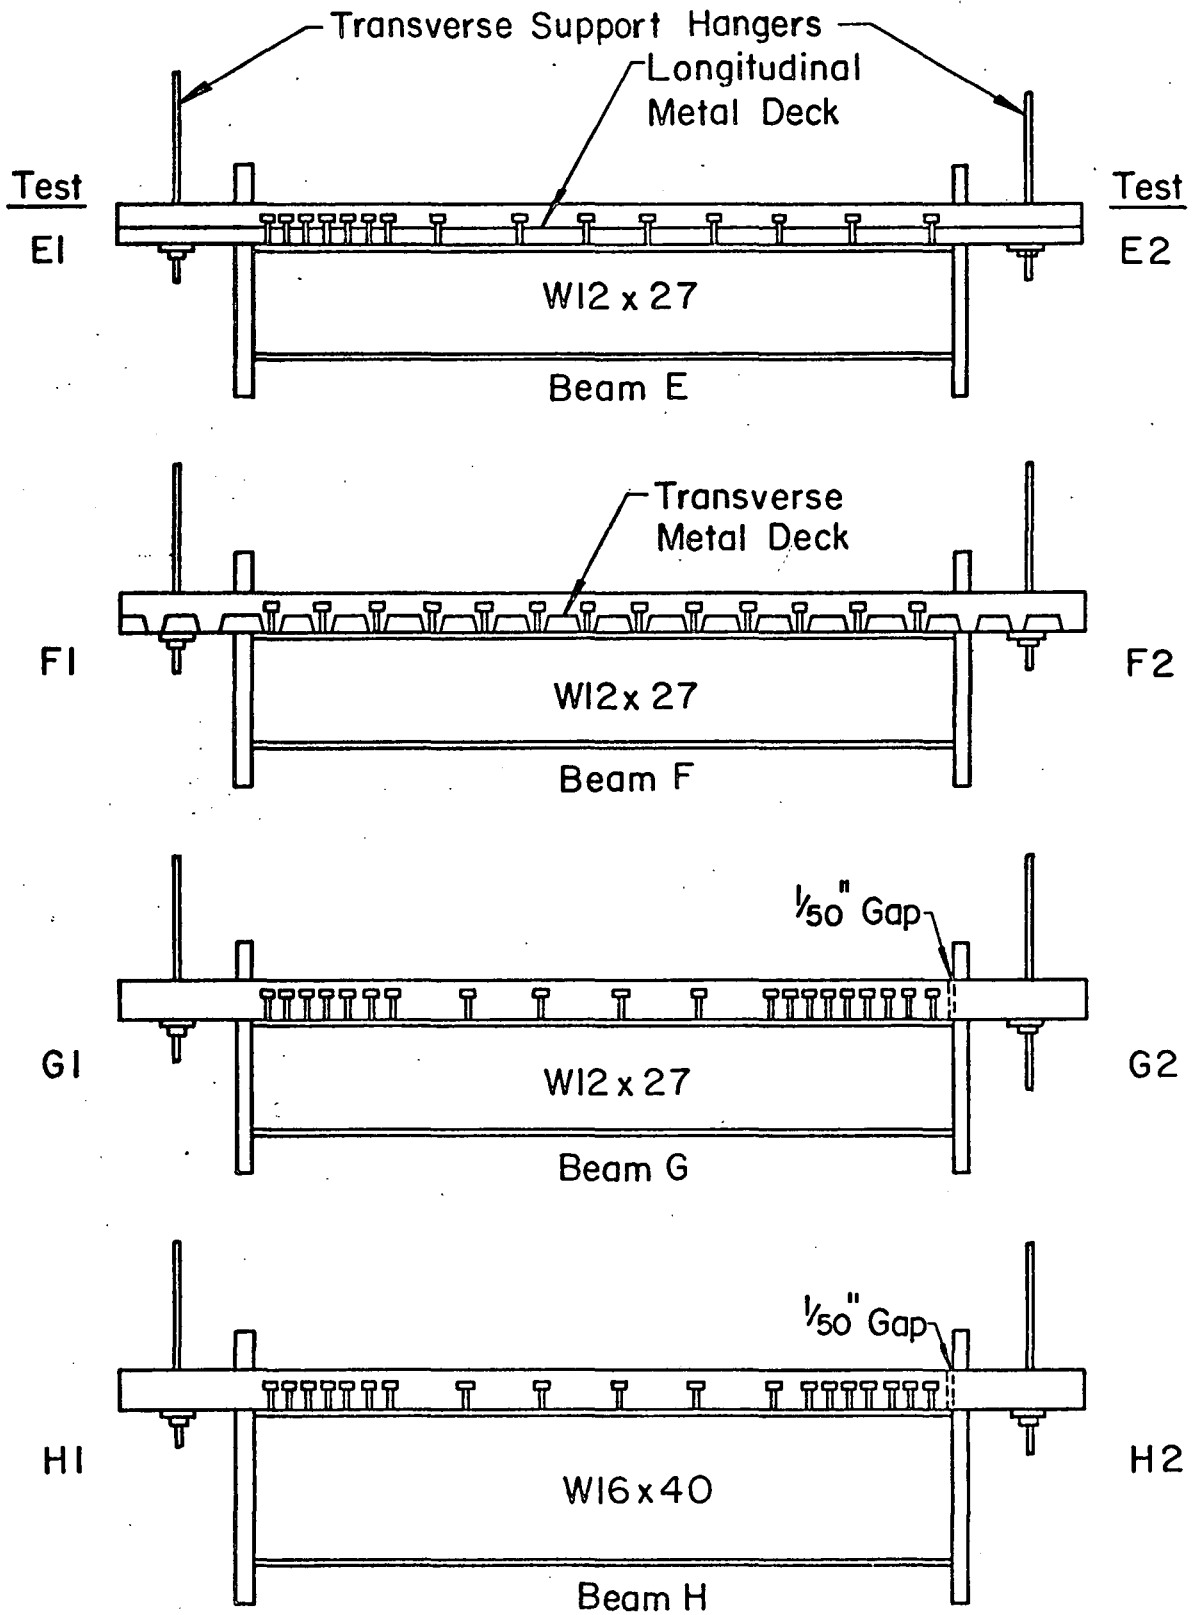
DETAIL OF TEST BEAMS E, F, G & H
